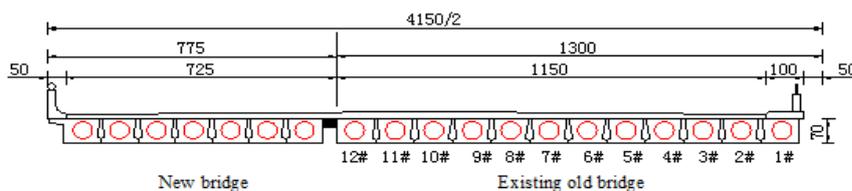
The Half Cross- section of Superstructure (unit = cm)
